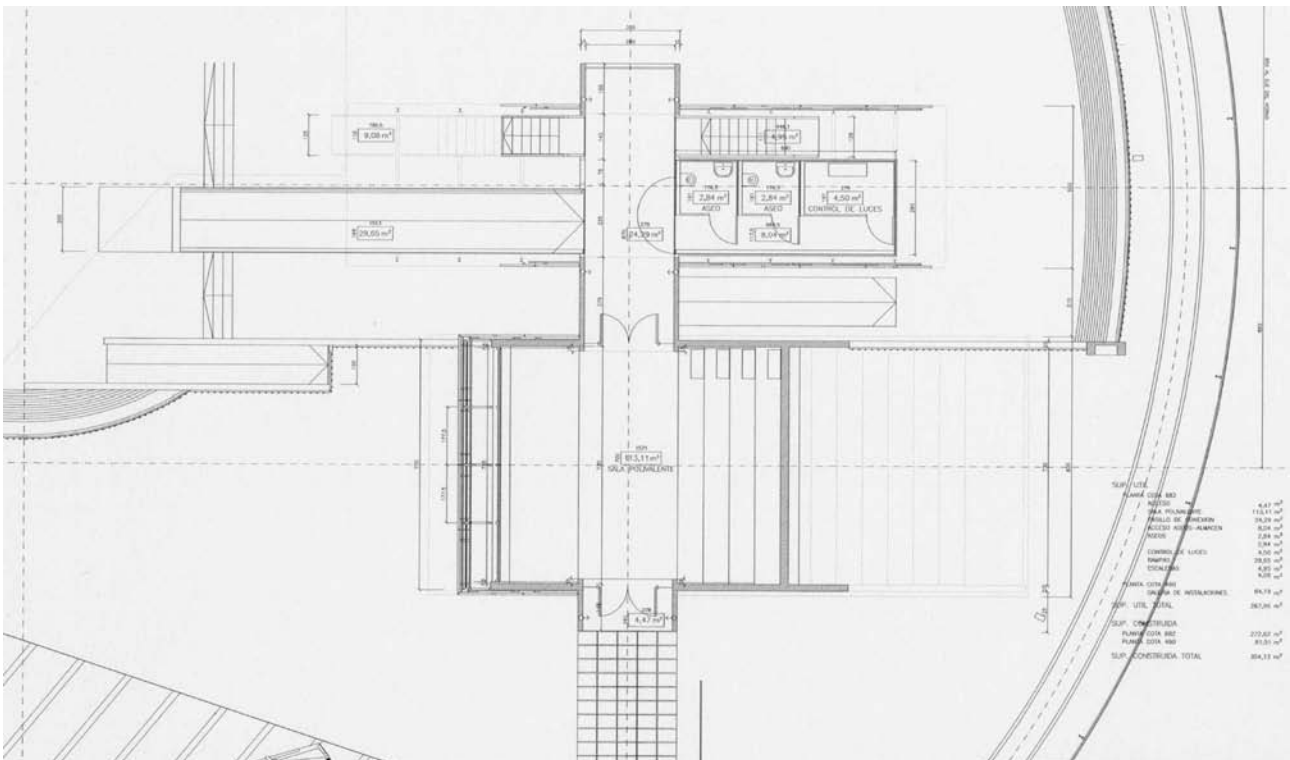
The reception pavilion floor: the multi-purpose hall (in the lower part of the picture) and the access and the toilets (above) are connected by a central corridor
